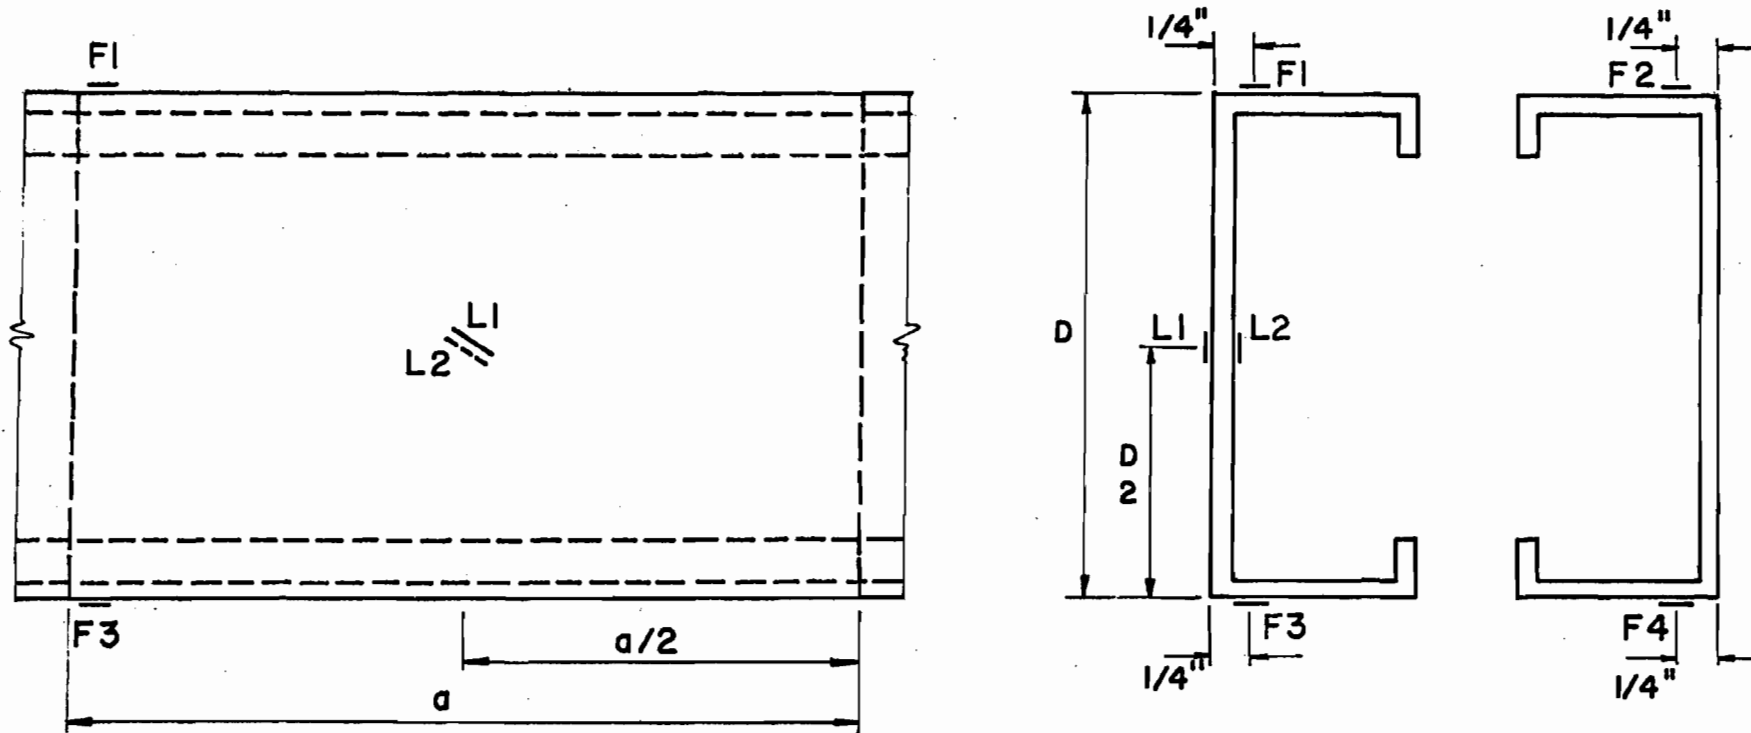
Location of Strain Gages for Beam Specimens (Shear Test Setups -A and C)
